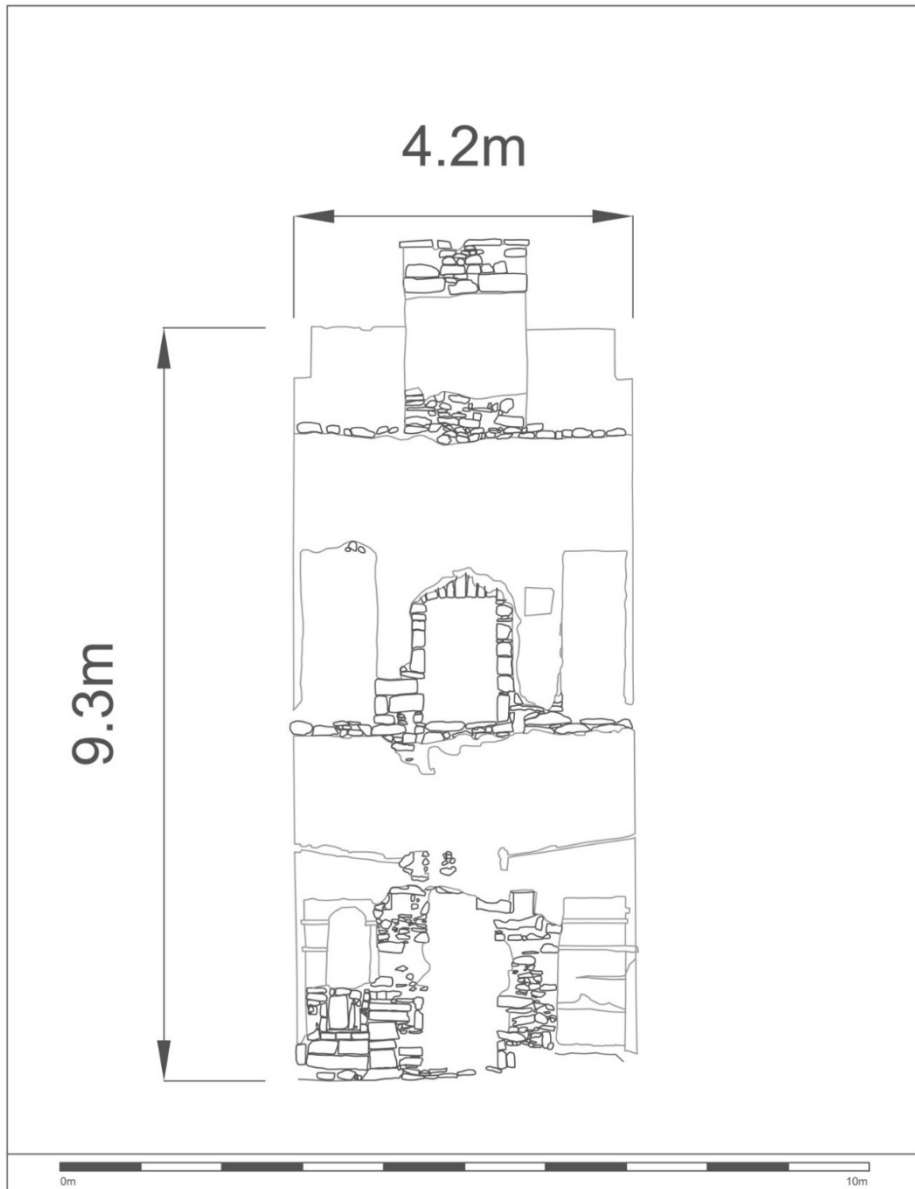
Internal elevation of the south wall of the signal tower at Rathlee Signal Station.
